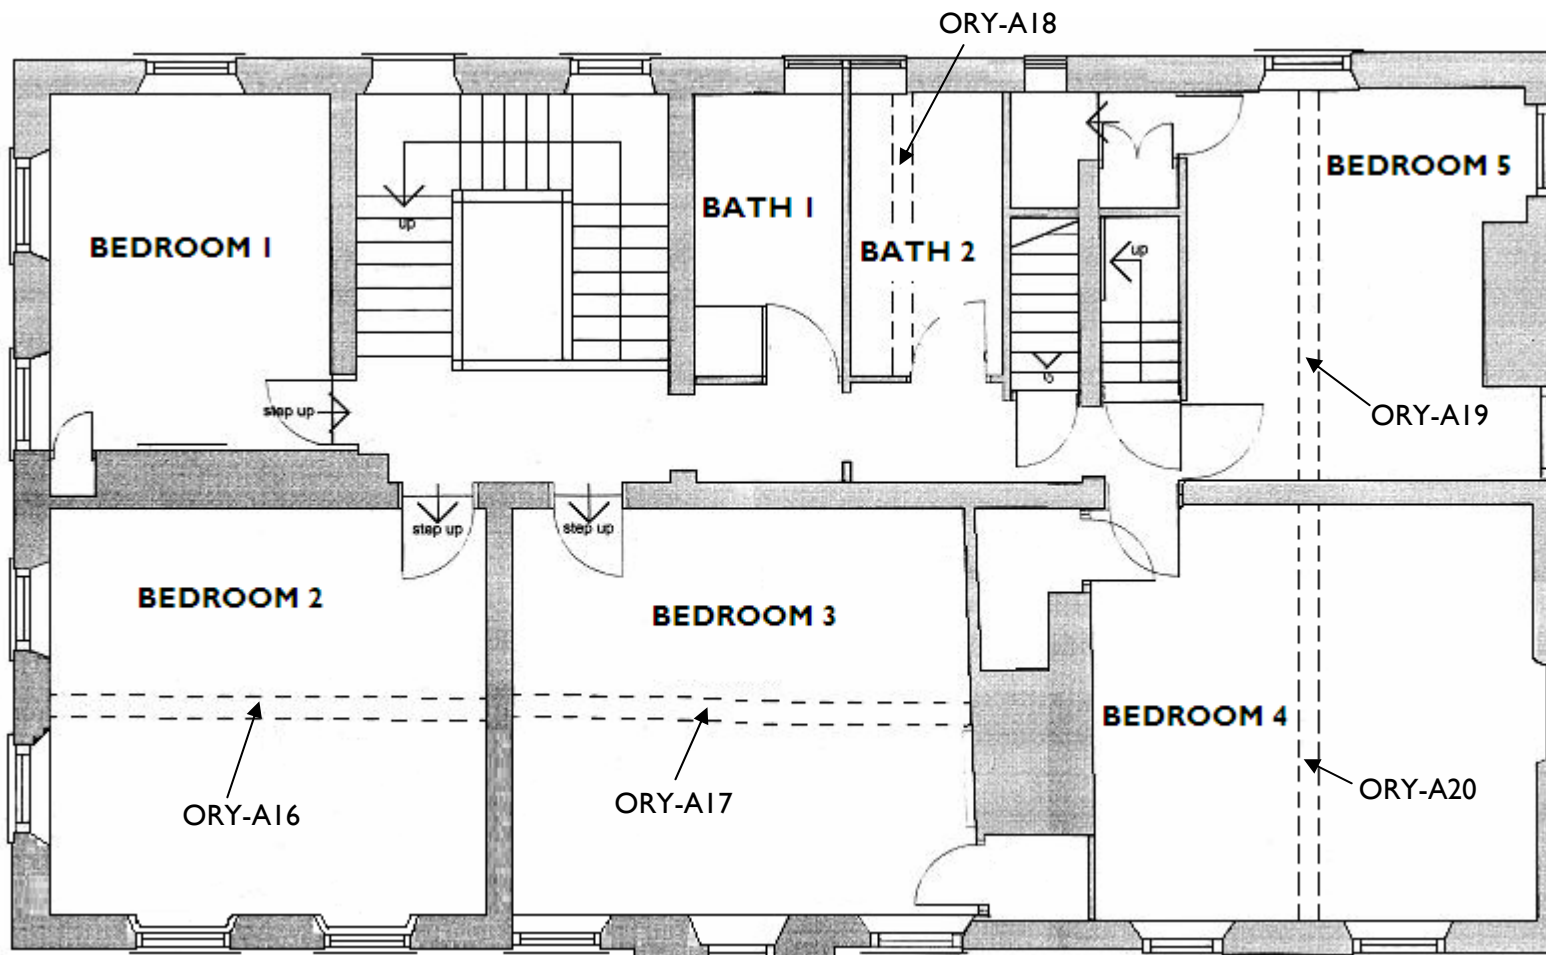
The Old Rectory; First-floor plan, showing the location of samples ORY-A16–20 (David Glew Architect & Surveyor)
